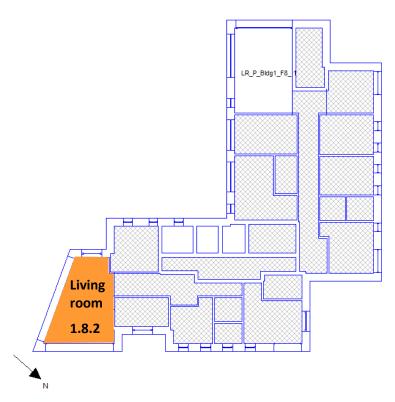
Level 8 living rooms in Building 1 (larger plan in Appendix A)
